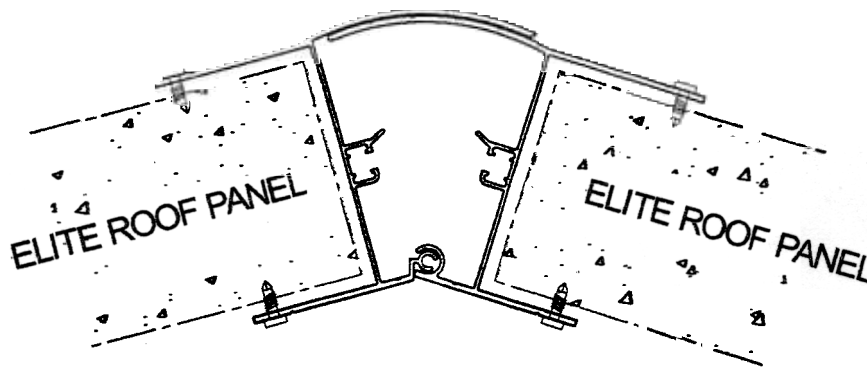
ELITE ADJUSTABLE RIDGE BEAM
